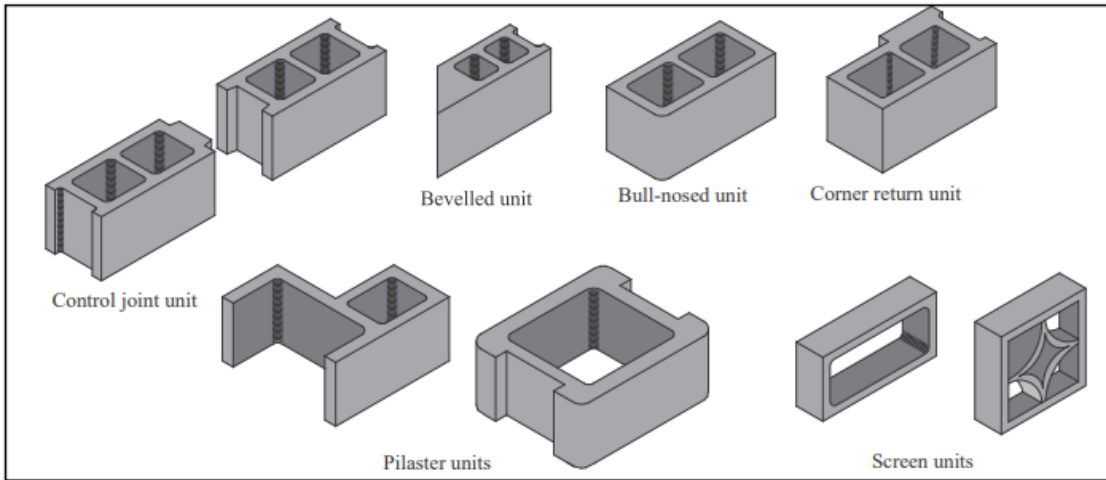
shows units developed for specific wall applications. Control joint units are manufactured with one male and one female end to provide lateral load transfer across control joints. Bull-nosed units are available with either a single or double bull nose, to soften corners. Screen units are available in many sizes and patterns (ref. 4). Typical applications include exterior fences, interior partitions, and openings within interior concrete masonry walls. Bevelled-end units, forming a 45° angle with the face of the unit, are used to form walls intersecting at 135° angles. Units in adjacent courses overlap to form a running bond pattern at the corner. Pilaster and column units are used to easily accommodate a wall-column or wall- pilaster interface, allowing space for vertical reinforcement in the hollow center.
